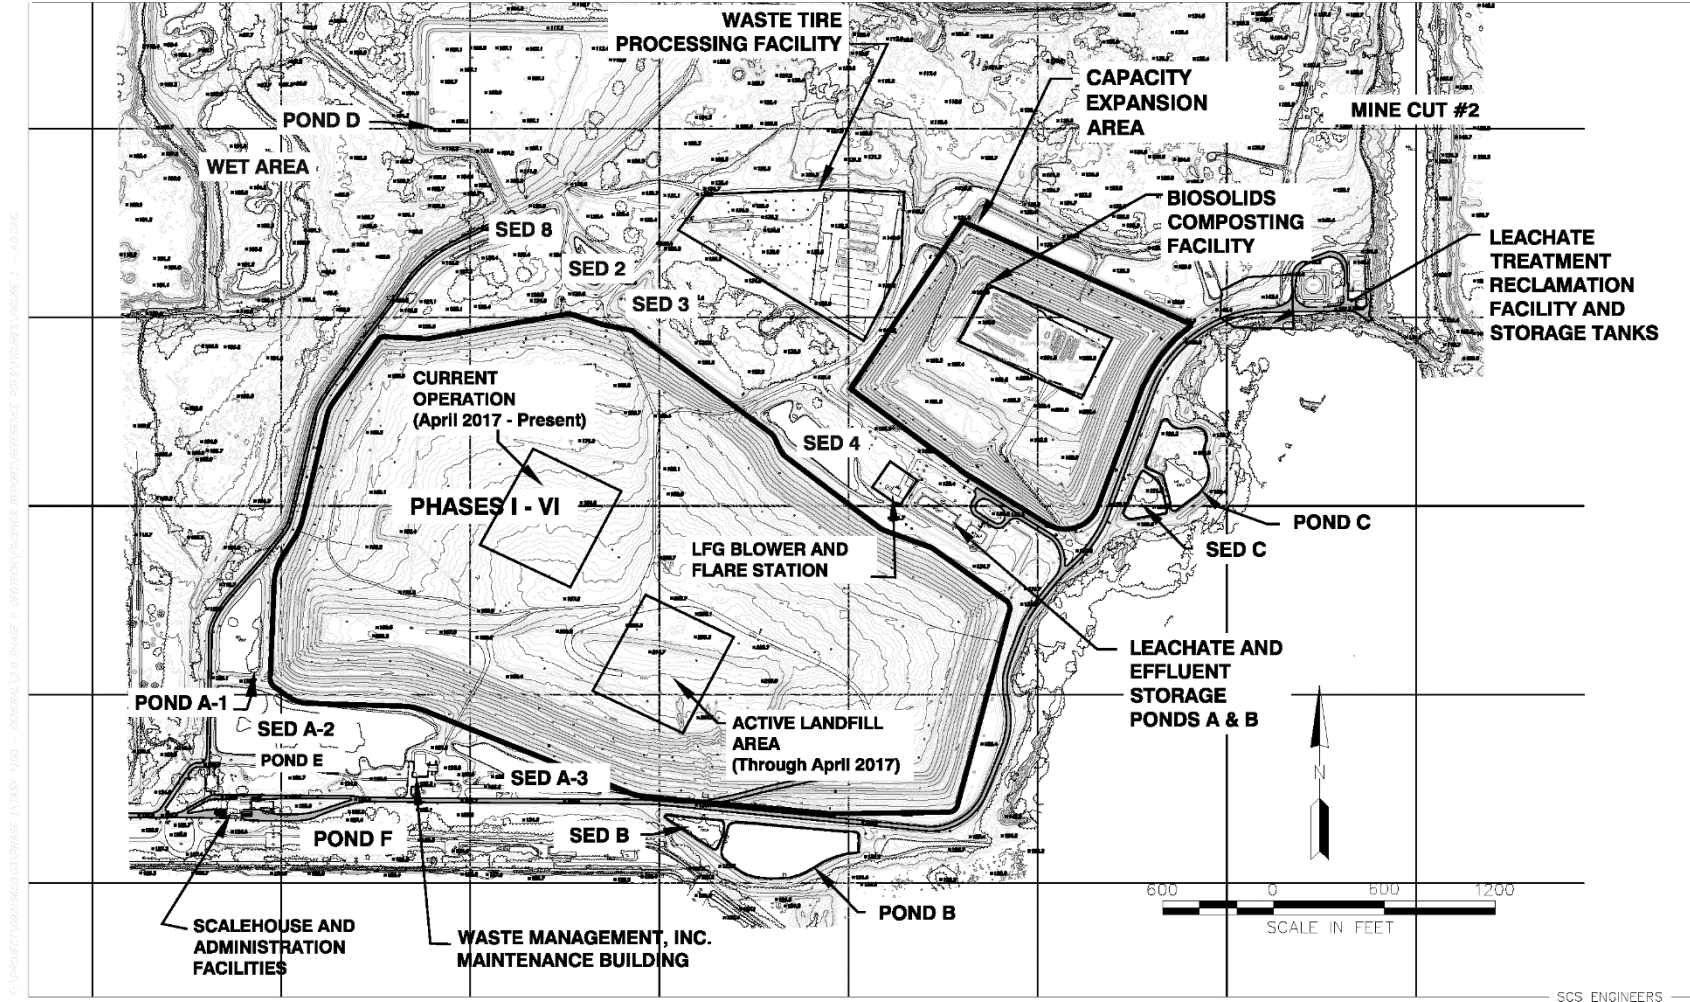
Site layout of SCLF. Phases I-VI are located in the southwest corner of the site near the scalehouse. Sections 7-9 (capacity expansion area) are located to the northeast of Phases I-VI. Figure was taken from the SCS corrective action plan from June 2017.
